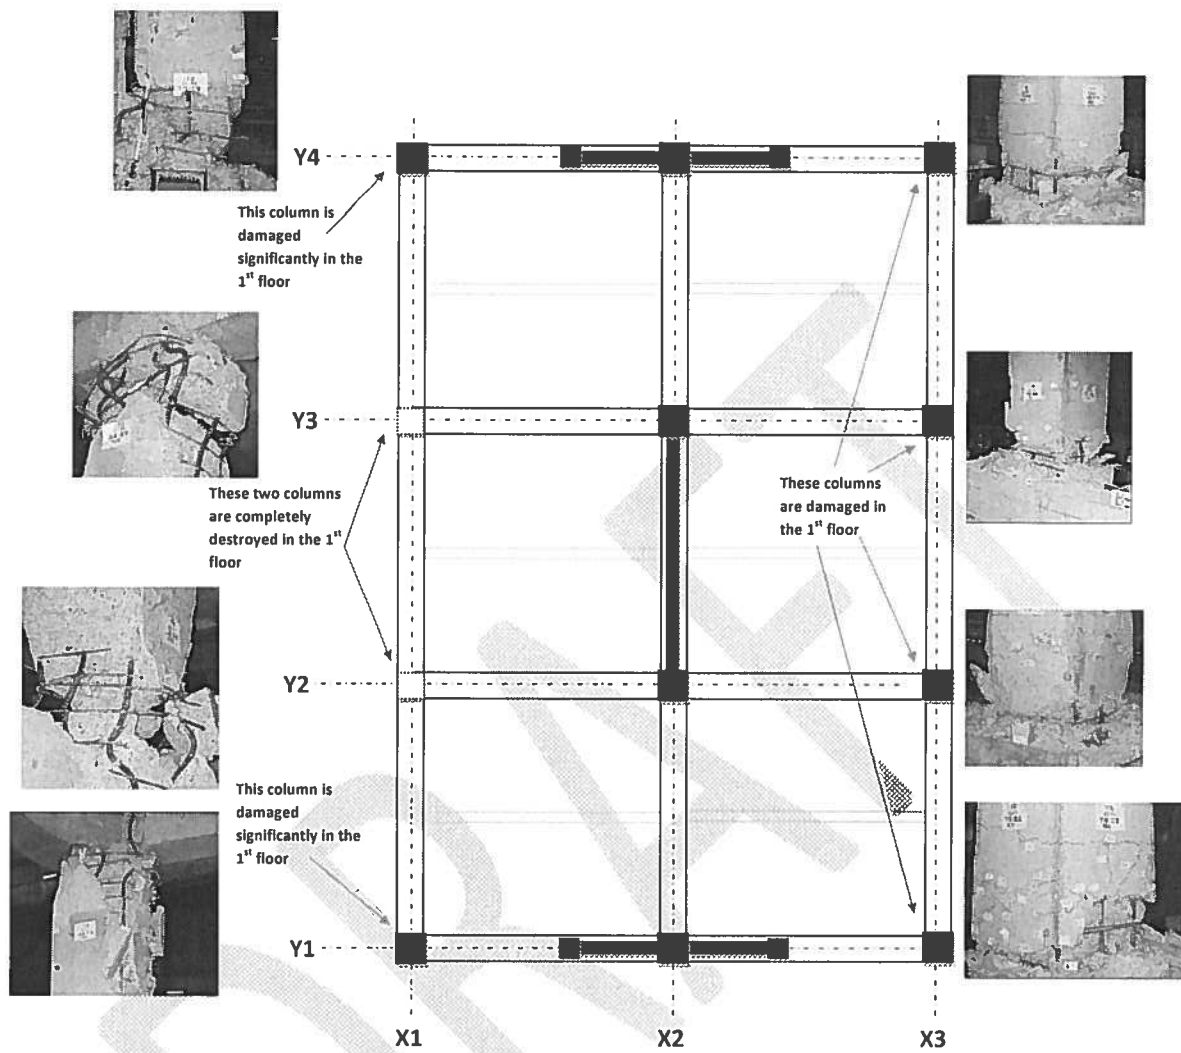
Photos taken after the shaking table test showing damage to the columns on the main floor. (Mostafaei and Kabeyasawa, 2010).
